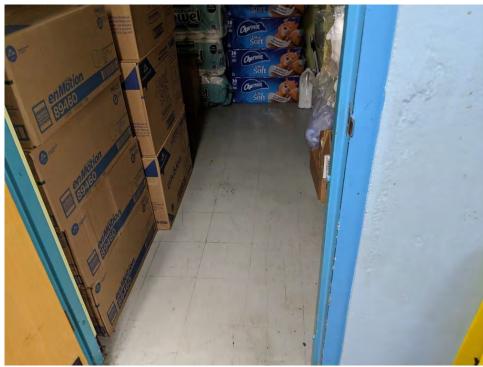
This photo shows ACM grey floor tile and black mastic under the floor tile in the storage closet.
